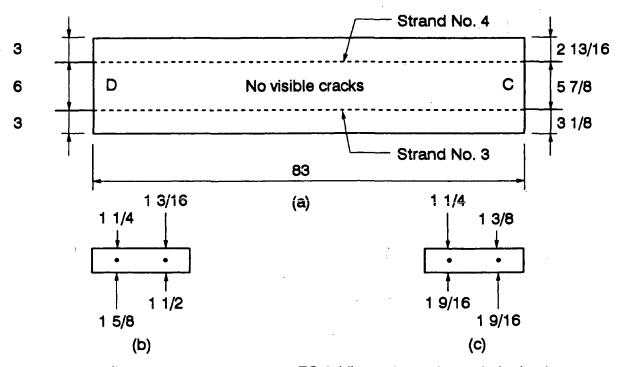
Specimen No. 2-3.0TC-8 (dimensions shown in inches):
